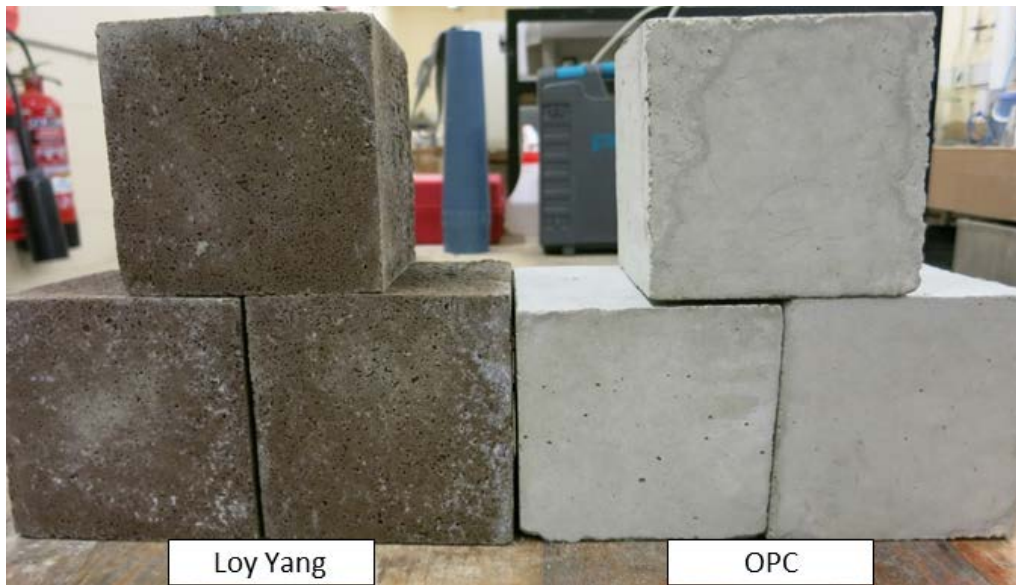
Loy Yang brown coal fly ash geopolymer concrete and OPC concrete
